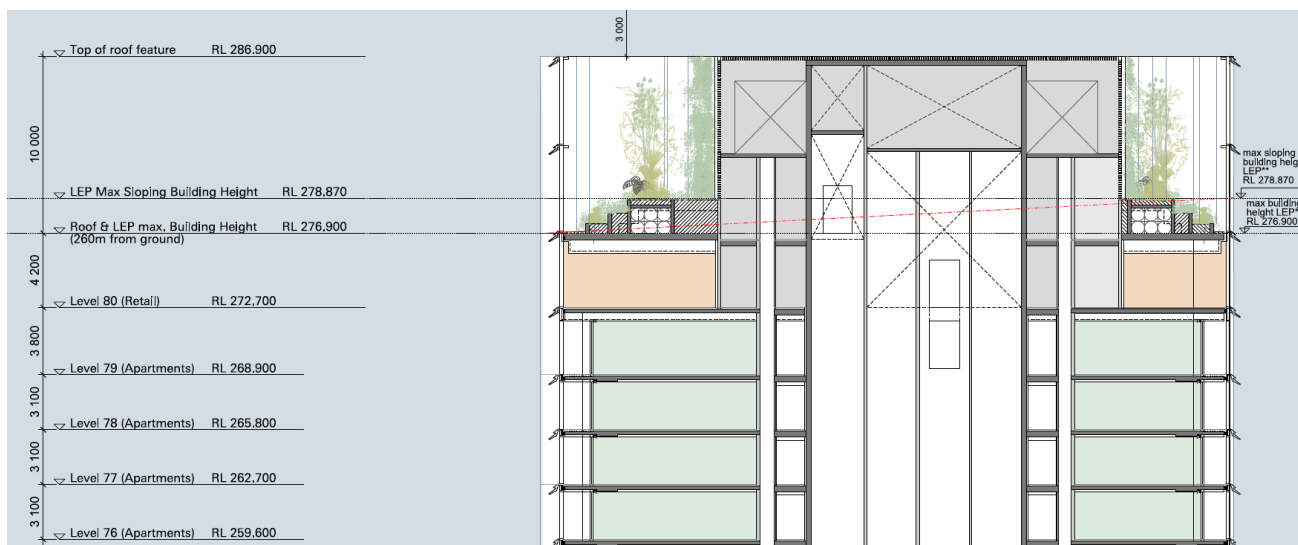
Section view of proposed architectural roof feature and extent of variation sought
